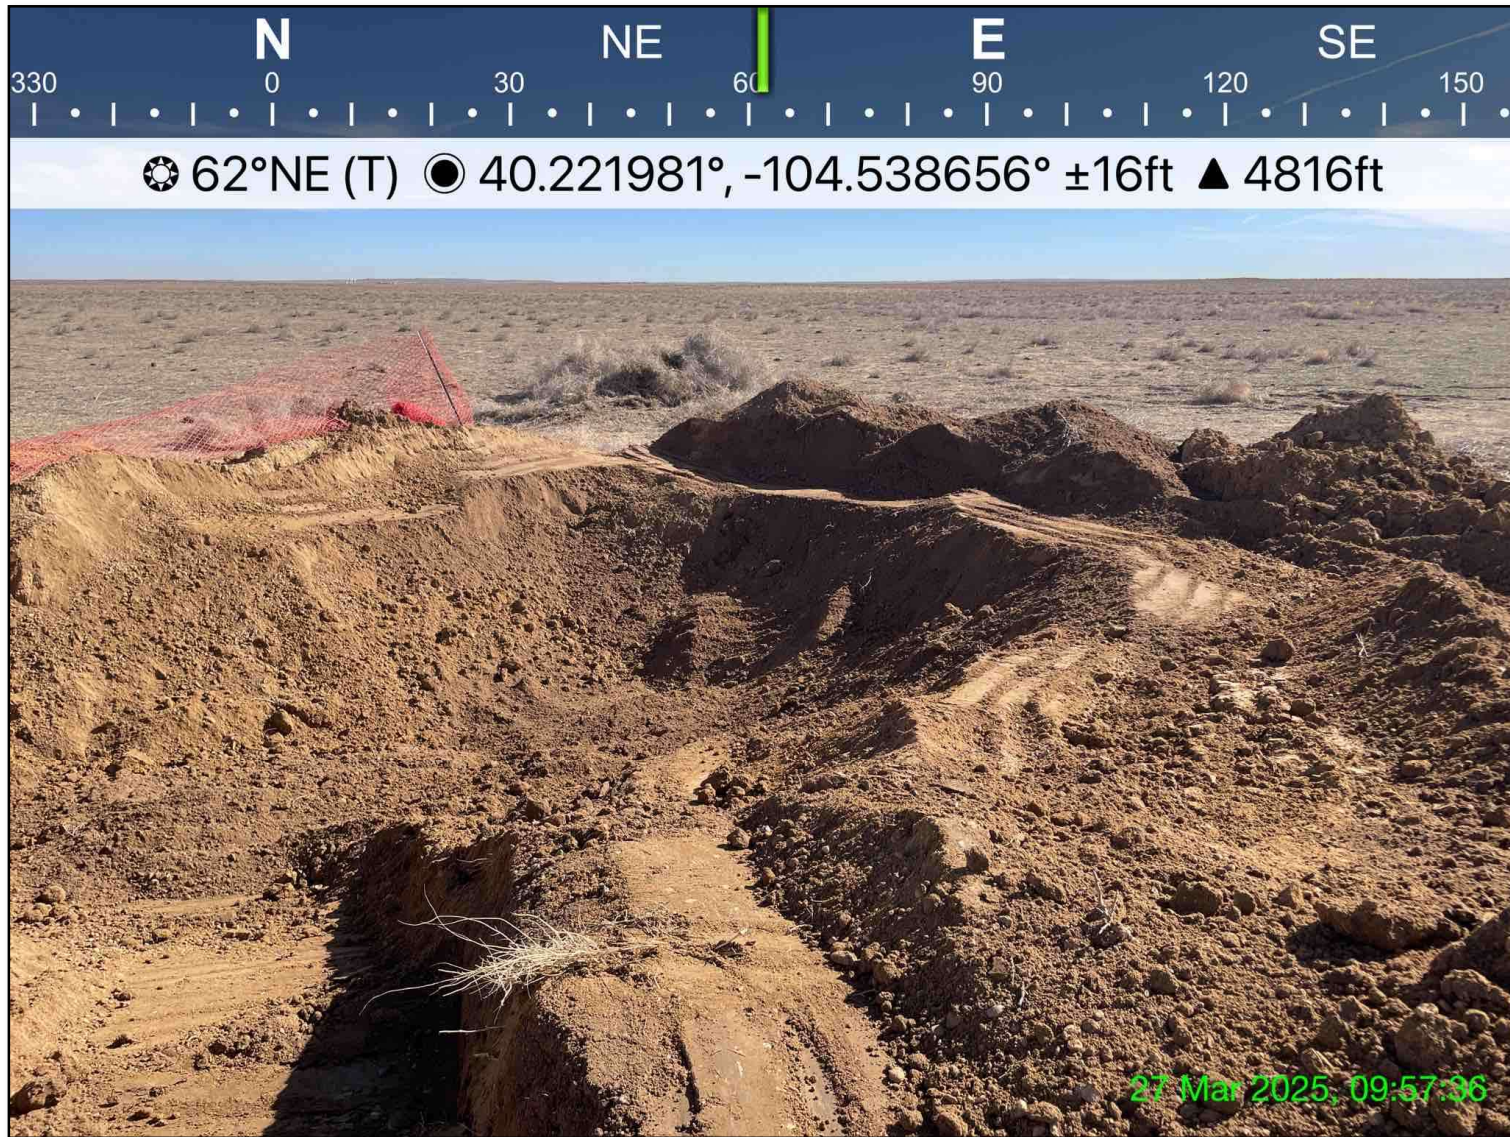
View of PWV03 and PWV04 excavation area, facing northeast.
